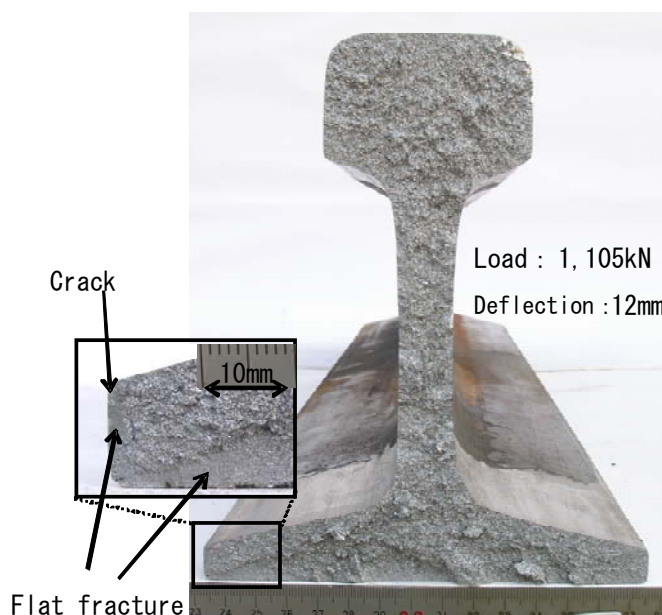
The appearance of fracture surface (TPNo.1-1)
